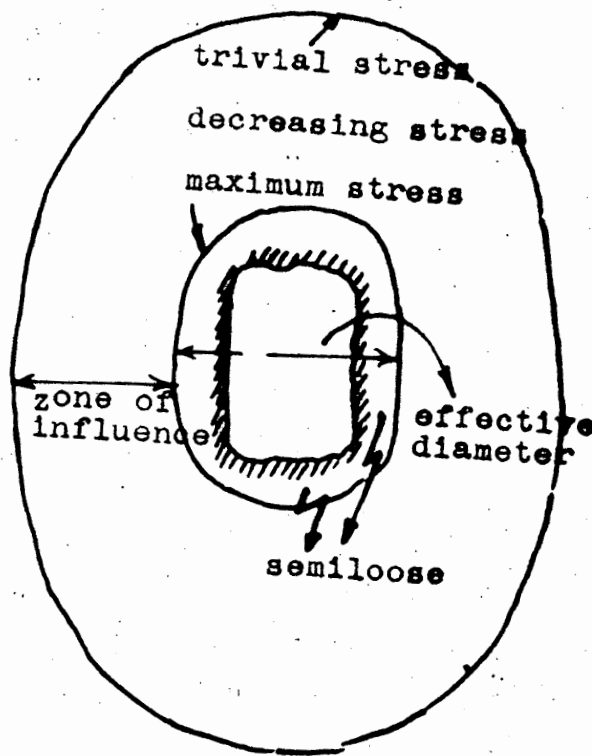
Zones Around an Underground Mine Opening. (after J. Spalding)
